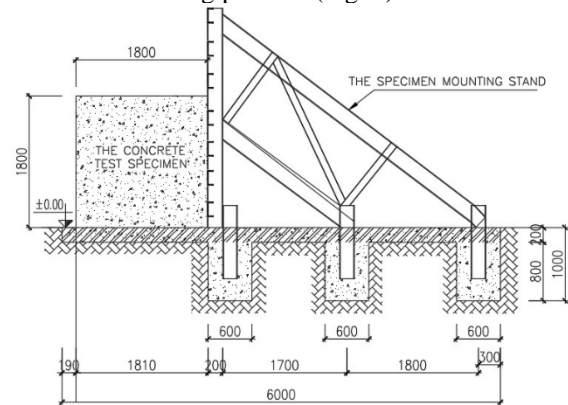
Support platform and concrete specimen mounting stand used in the experiment
